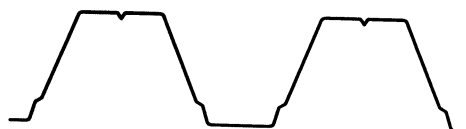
Part of typical trapezoidal profile with stiffened crown and web
